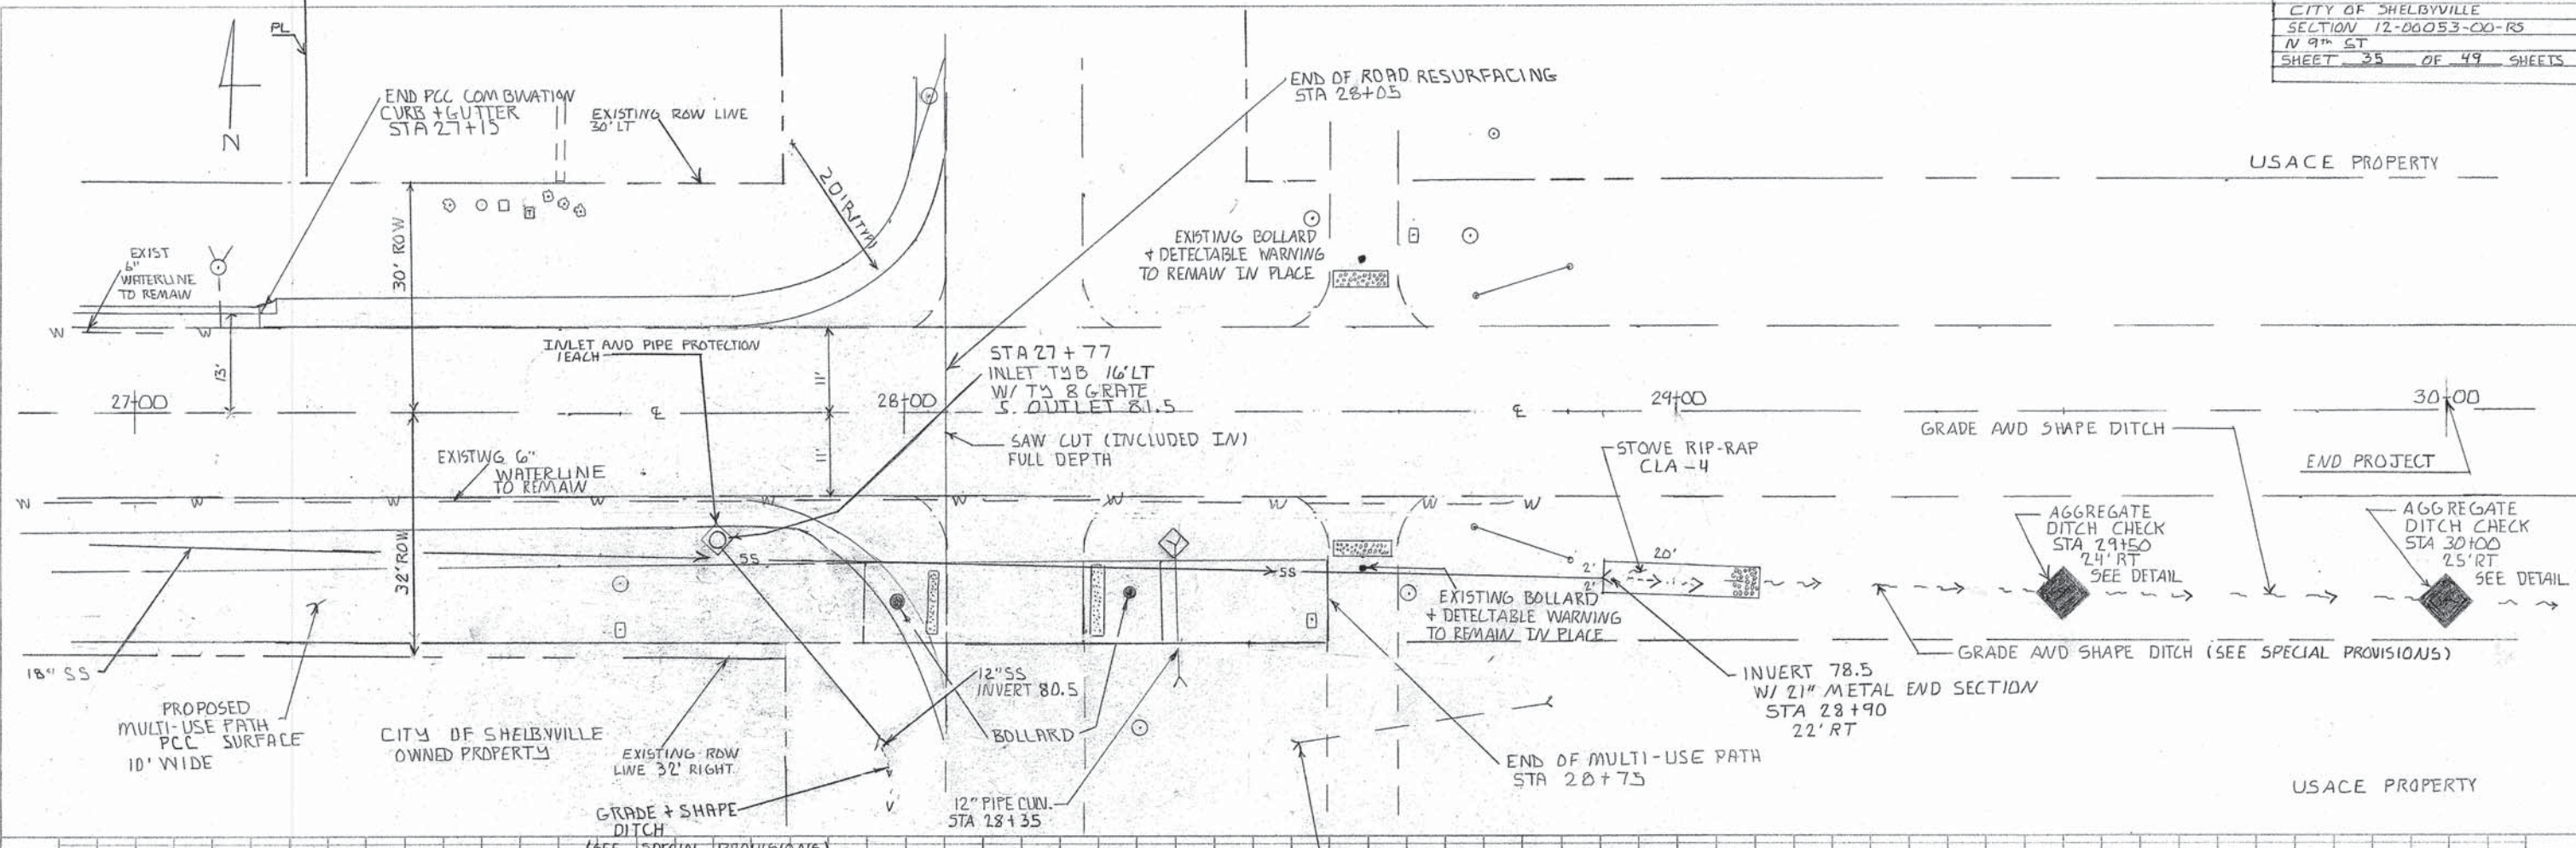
SINGLE PLAN AND PROFILE-FULL LINE
